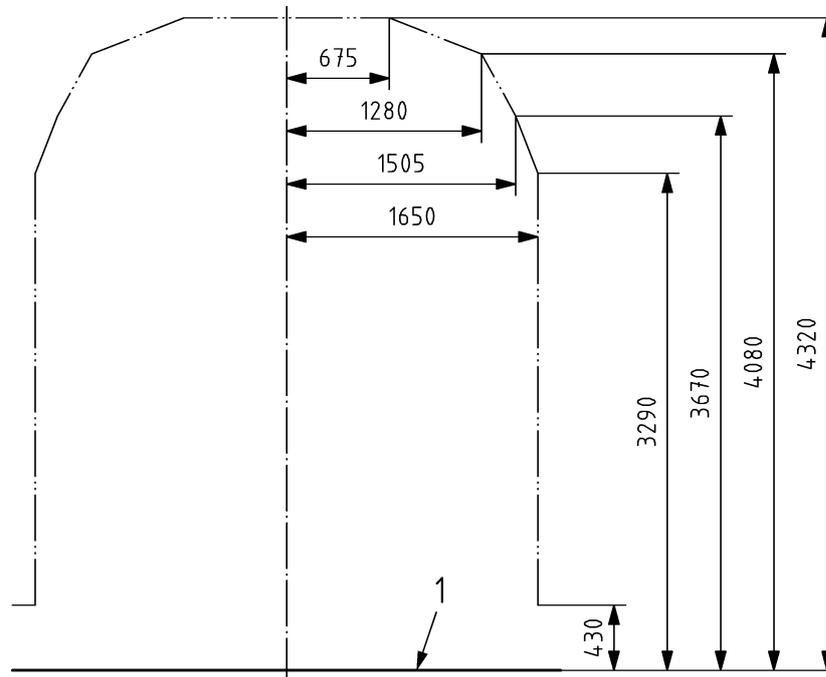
Reference profile of the upper parts of static gauge GEA16
